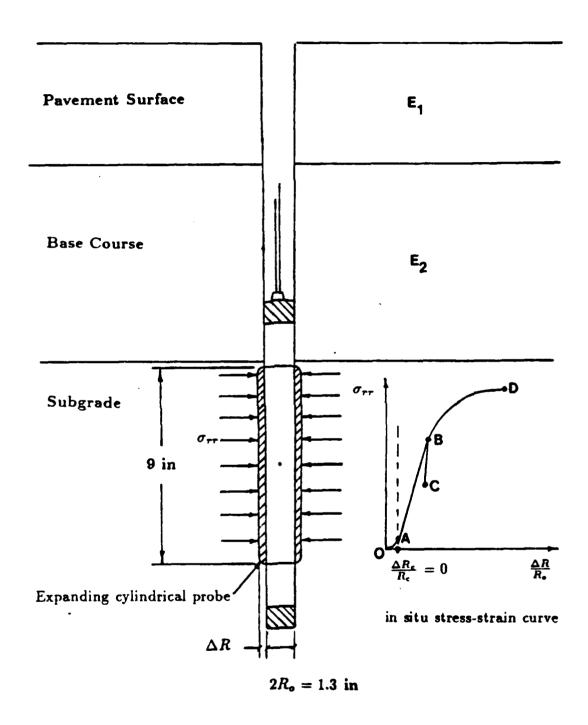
Typical Pavement Pressuremeter Test and Pavement Cross Section
